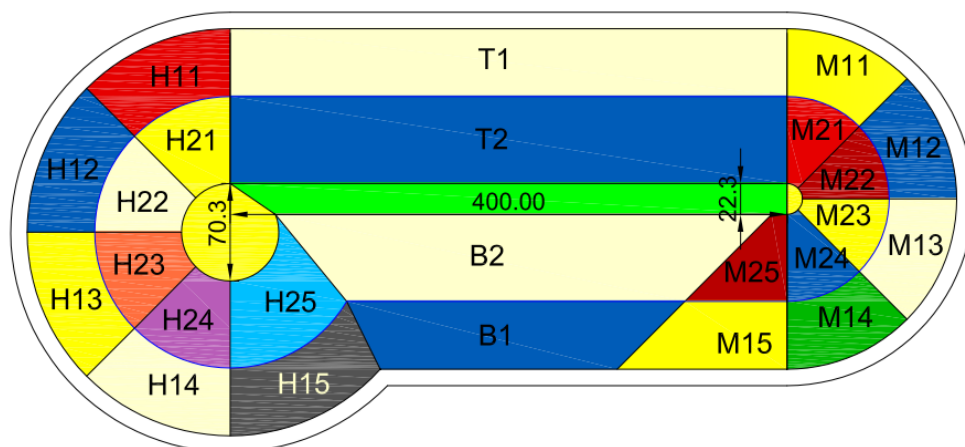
Plan view of double roundhead 3D model with single-layer Cubipod[®] armor tested at UDC and IH Cantabria.
